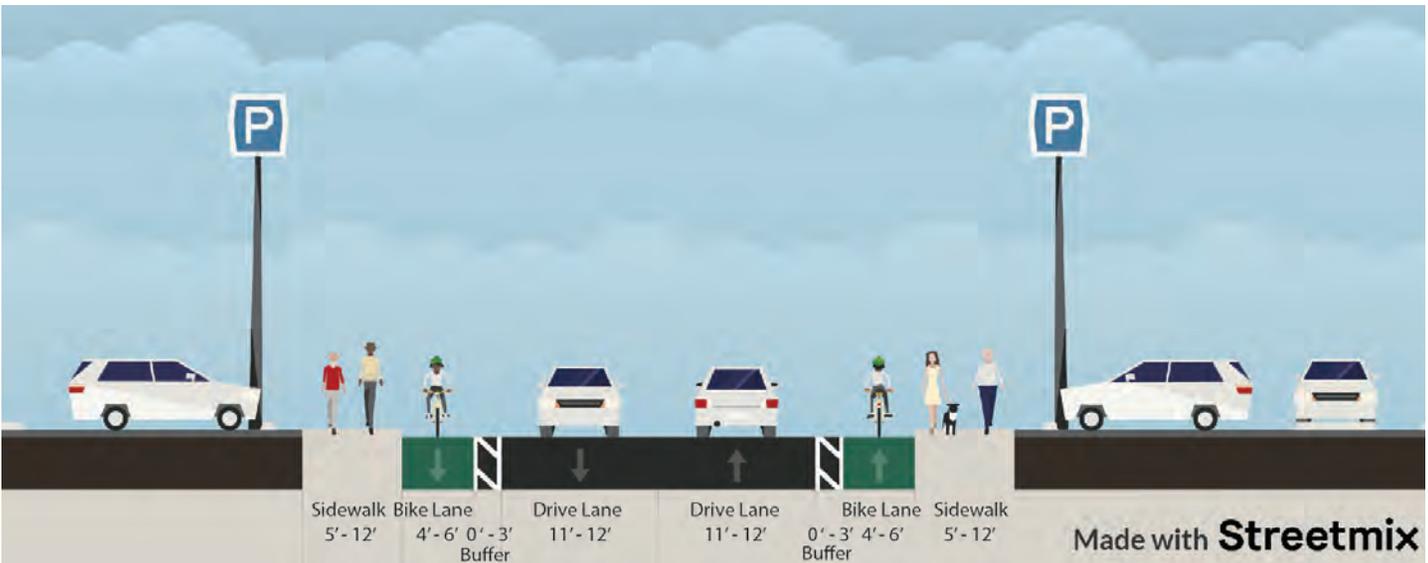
Suburban Commercial Center Cross Section Ranges with Onstreet Bike Lanes
